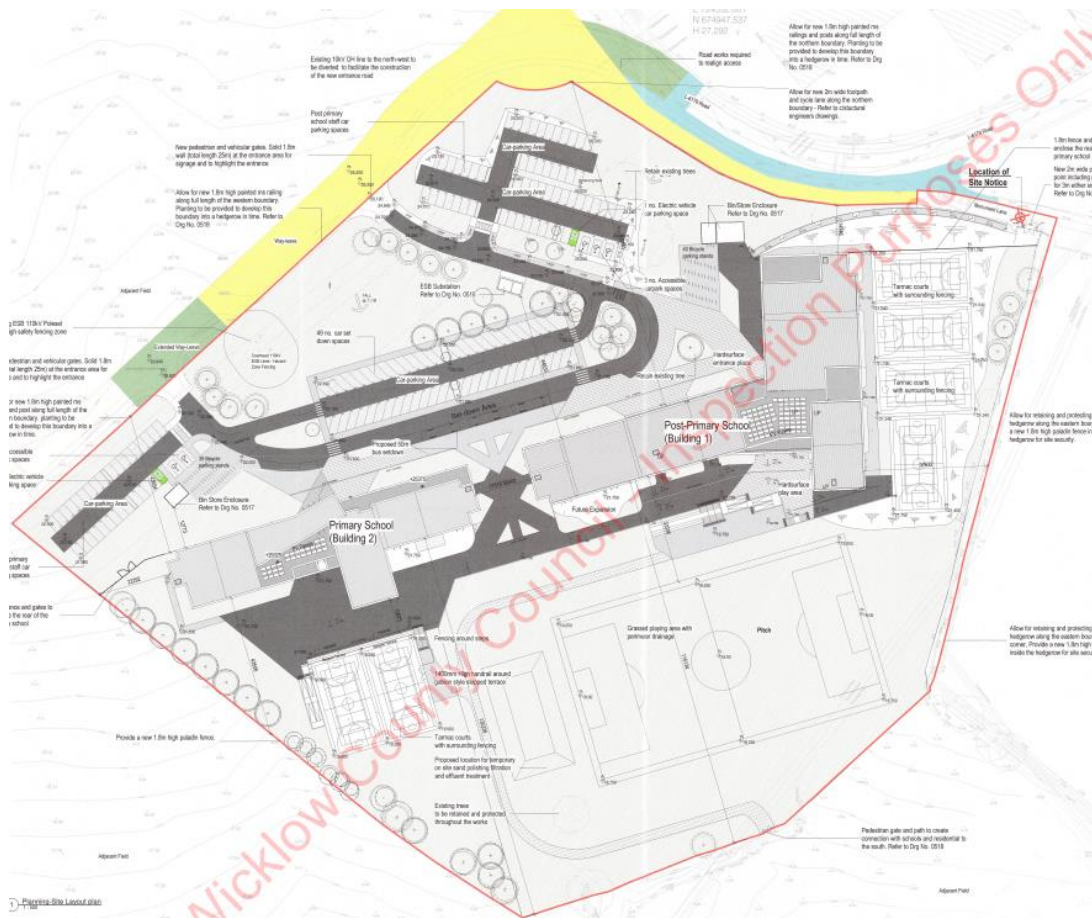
Site Plan for KWETB Primary and Post Primary Schools on Kilbride lands
